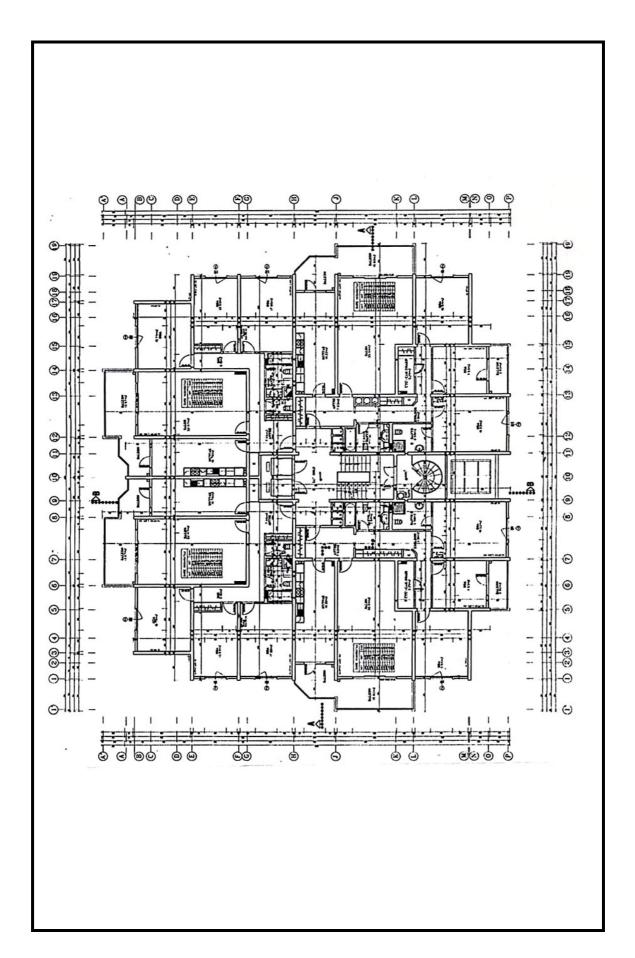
Mavişehir II; Flamingo 1st – 13th Floor Plan
